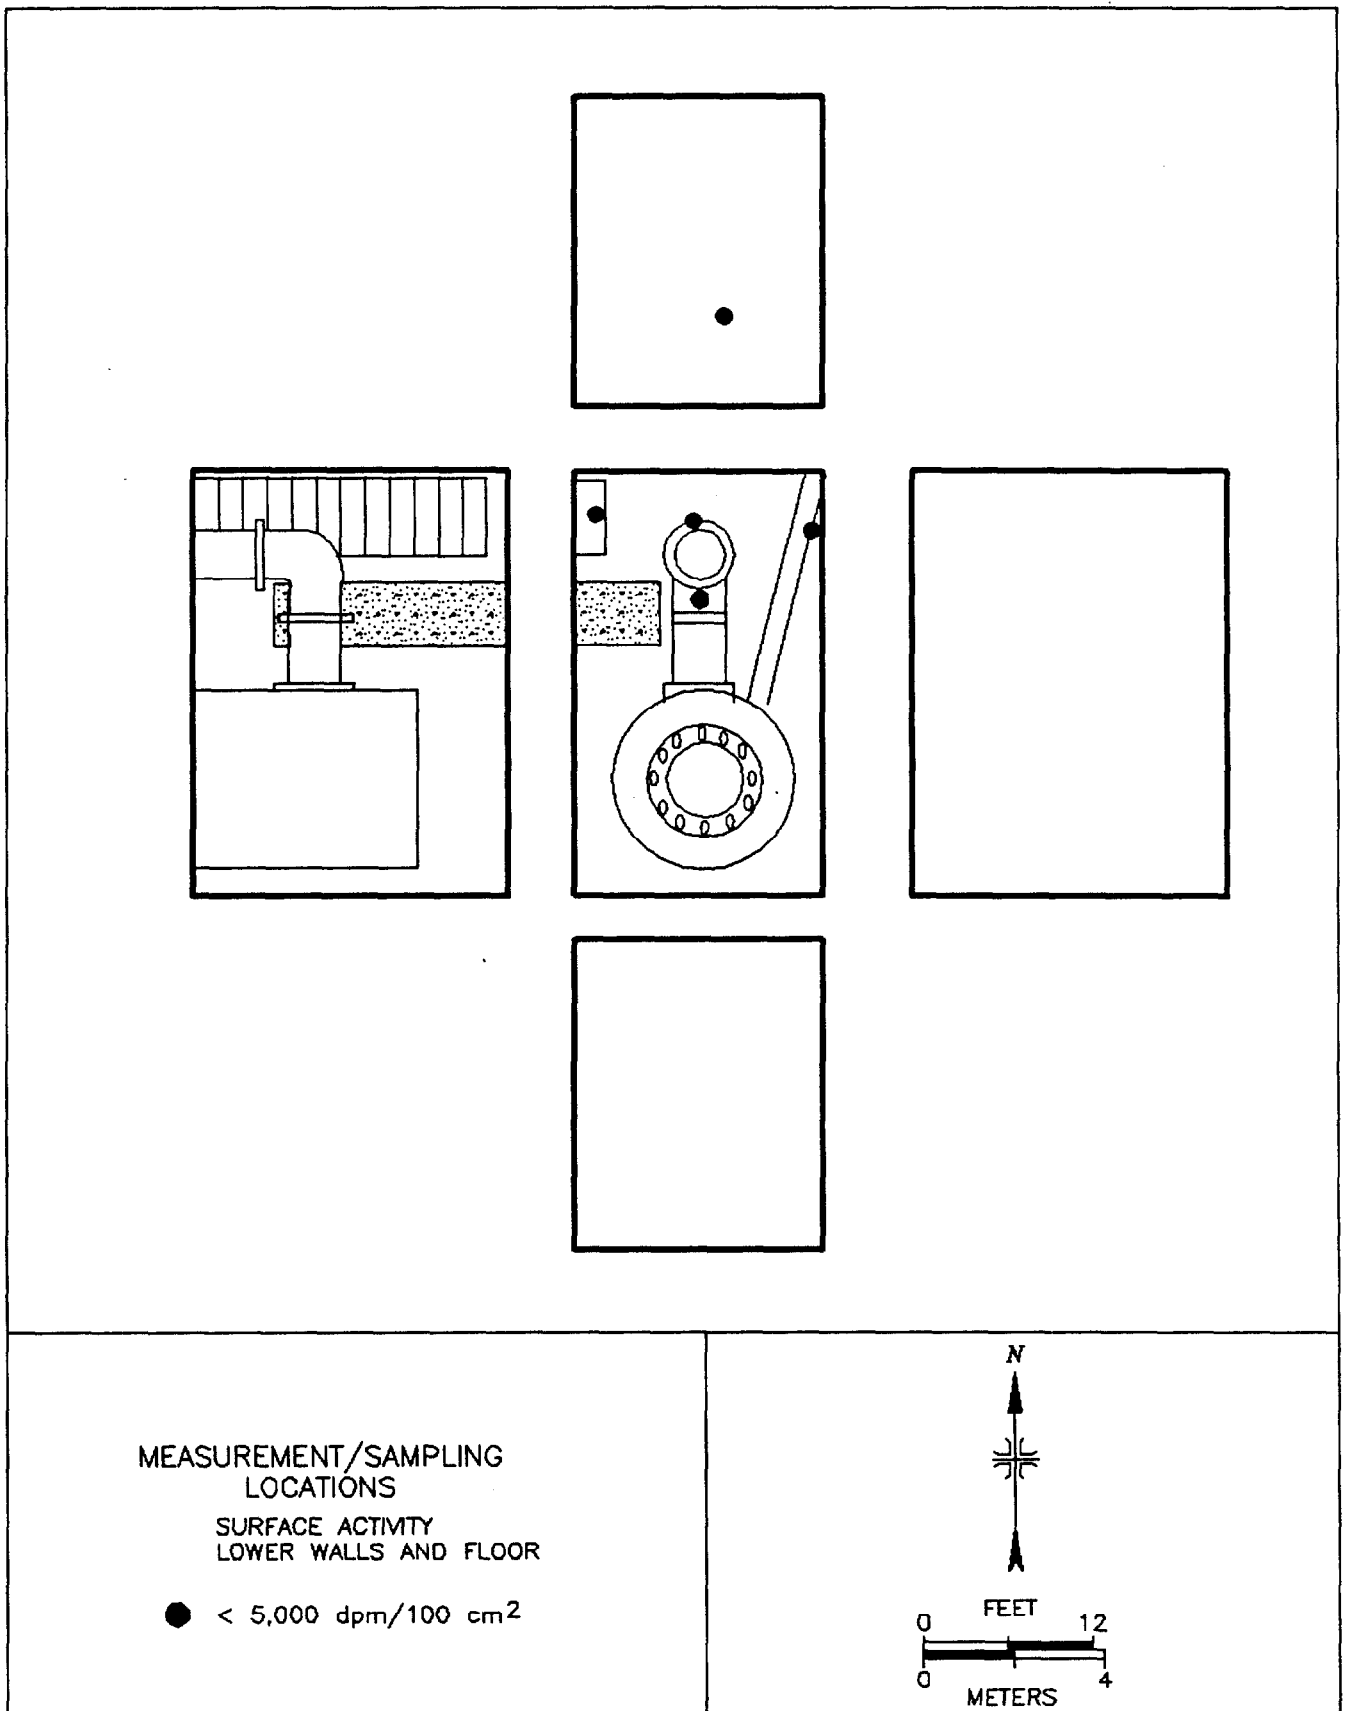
Building 8, Pit North of East Compressor - Measurement and Sampling Locations
